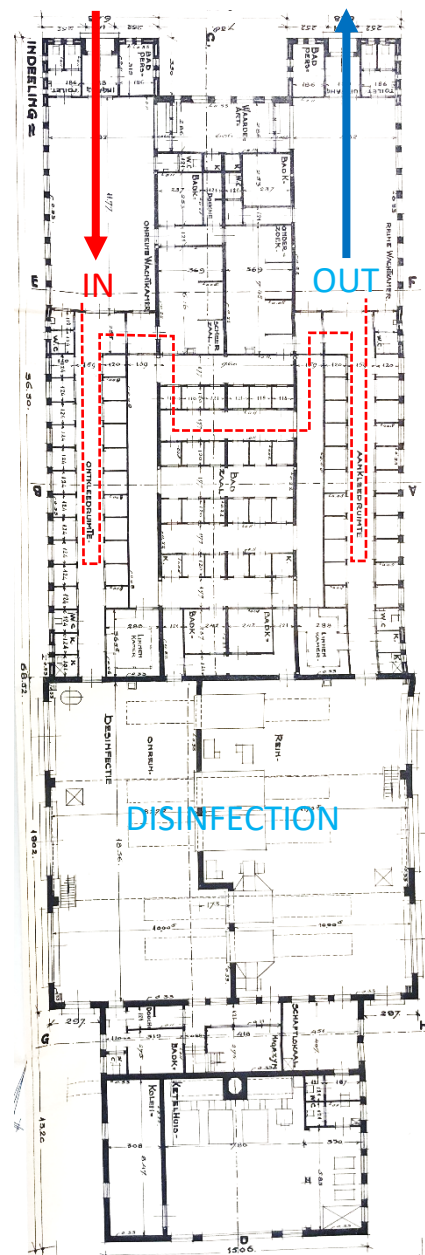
Floor plan of Decontamination building (Stadsarchief Rotterdam), (edited by Atciyurt)
